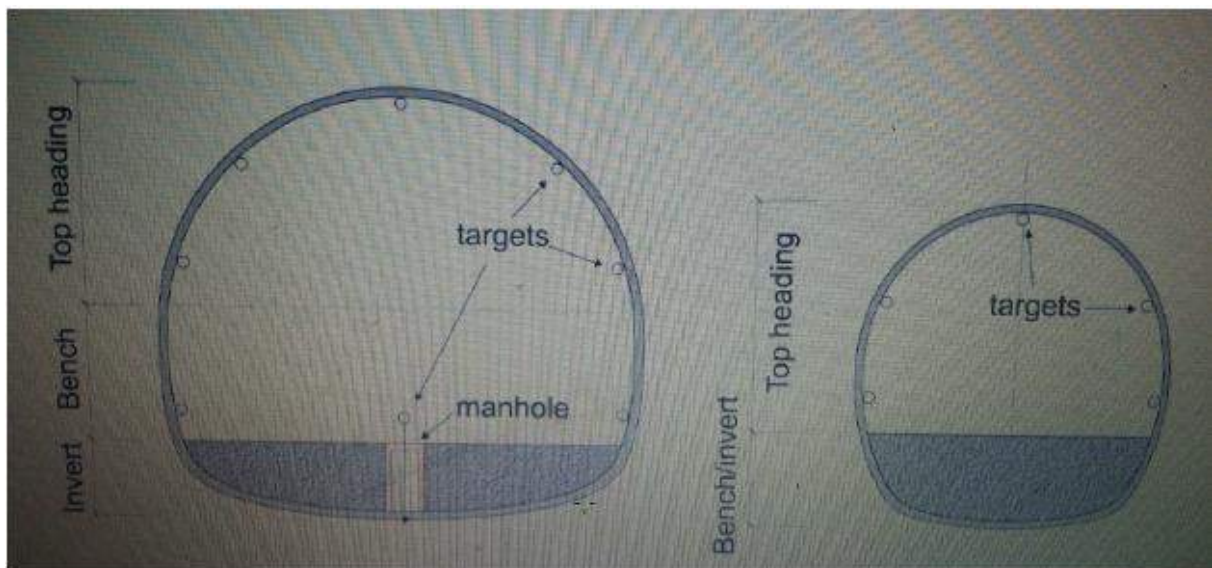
Sketch of monitoring layout for cavern or tunnel with sidewall galleries. [27]
